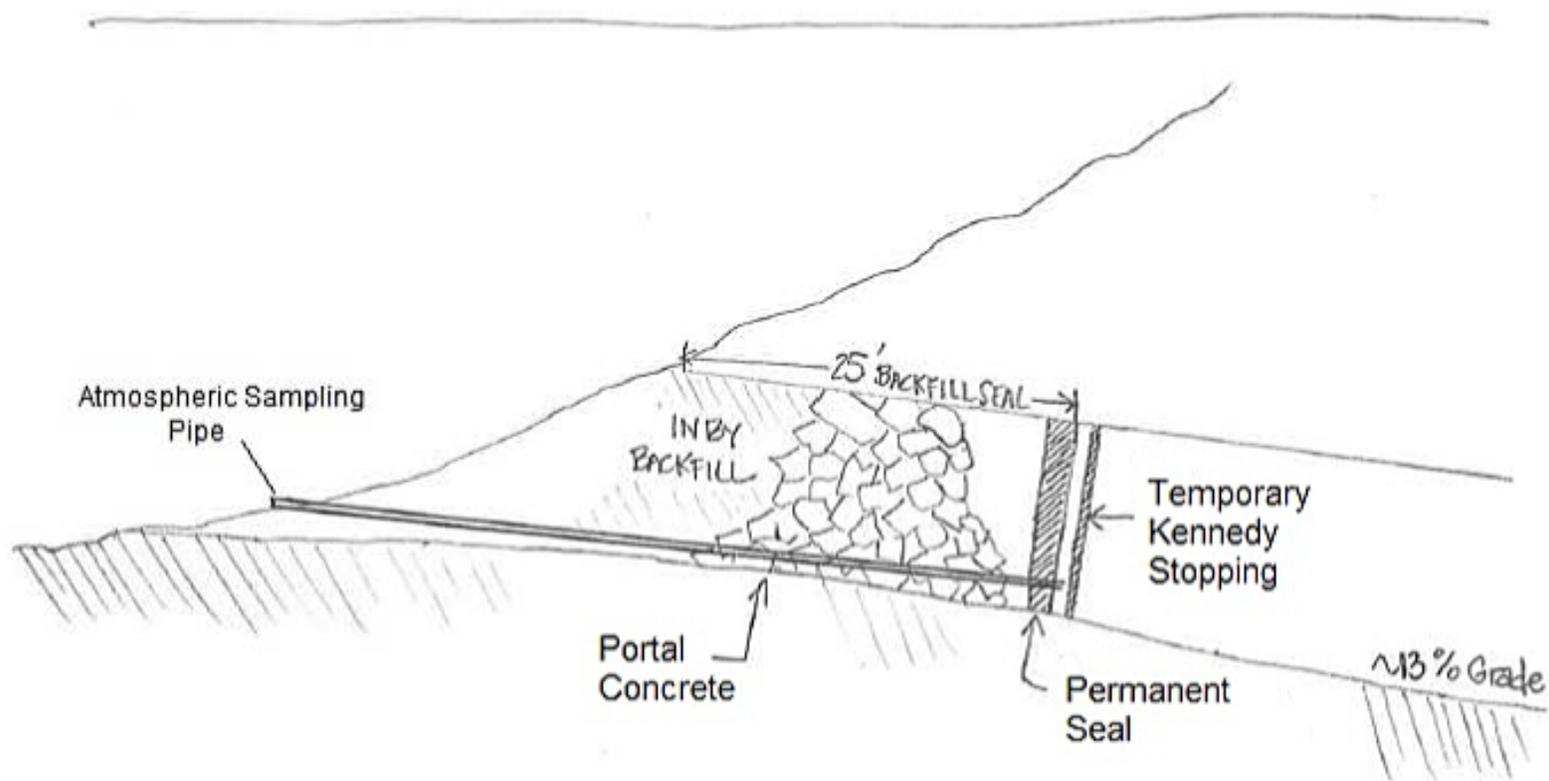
Fan Portal with temporary seal. The concrete portal collar shall be collapsed far enough back to reconstruct and re-establish the channel in its place.
